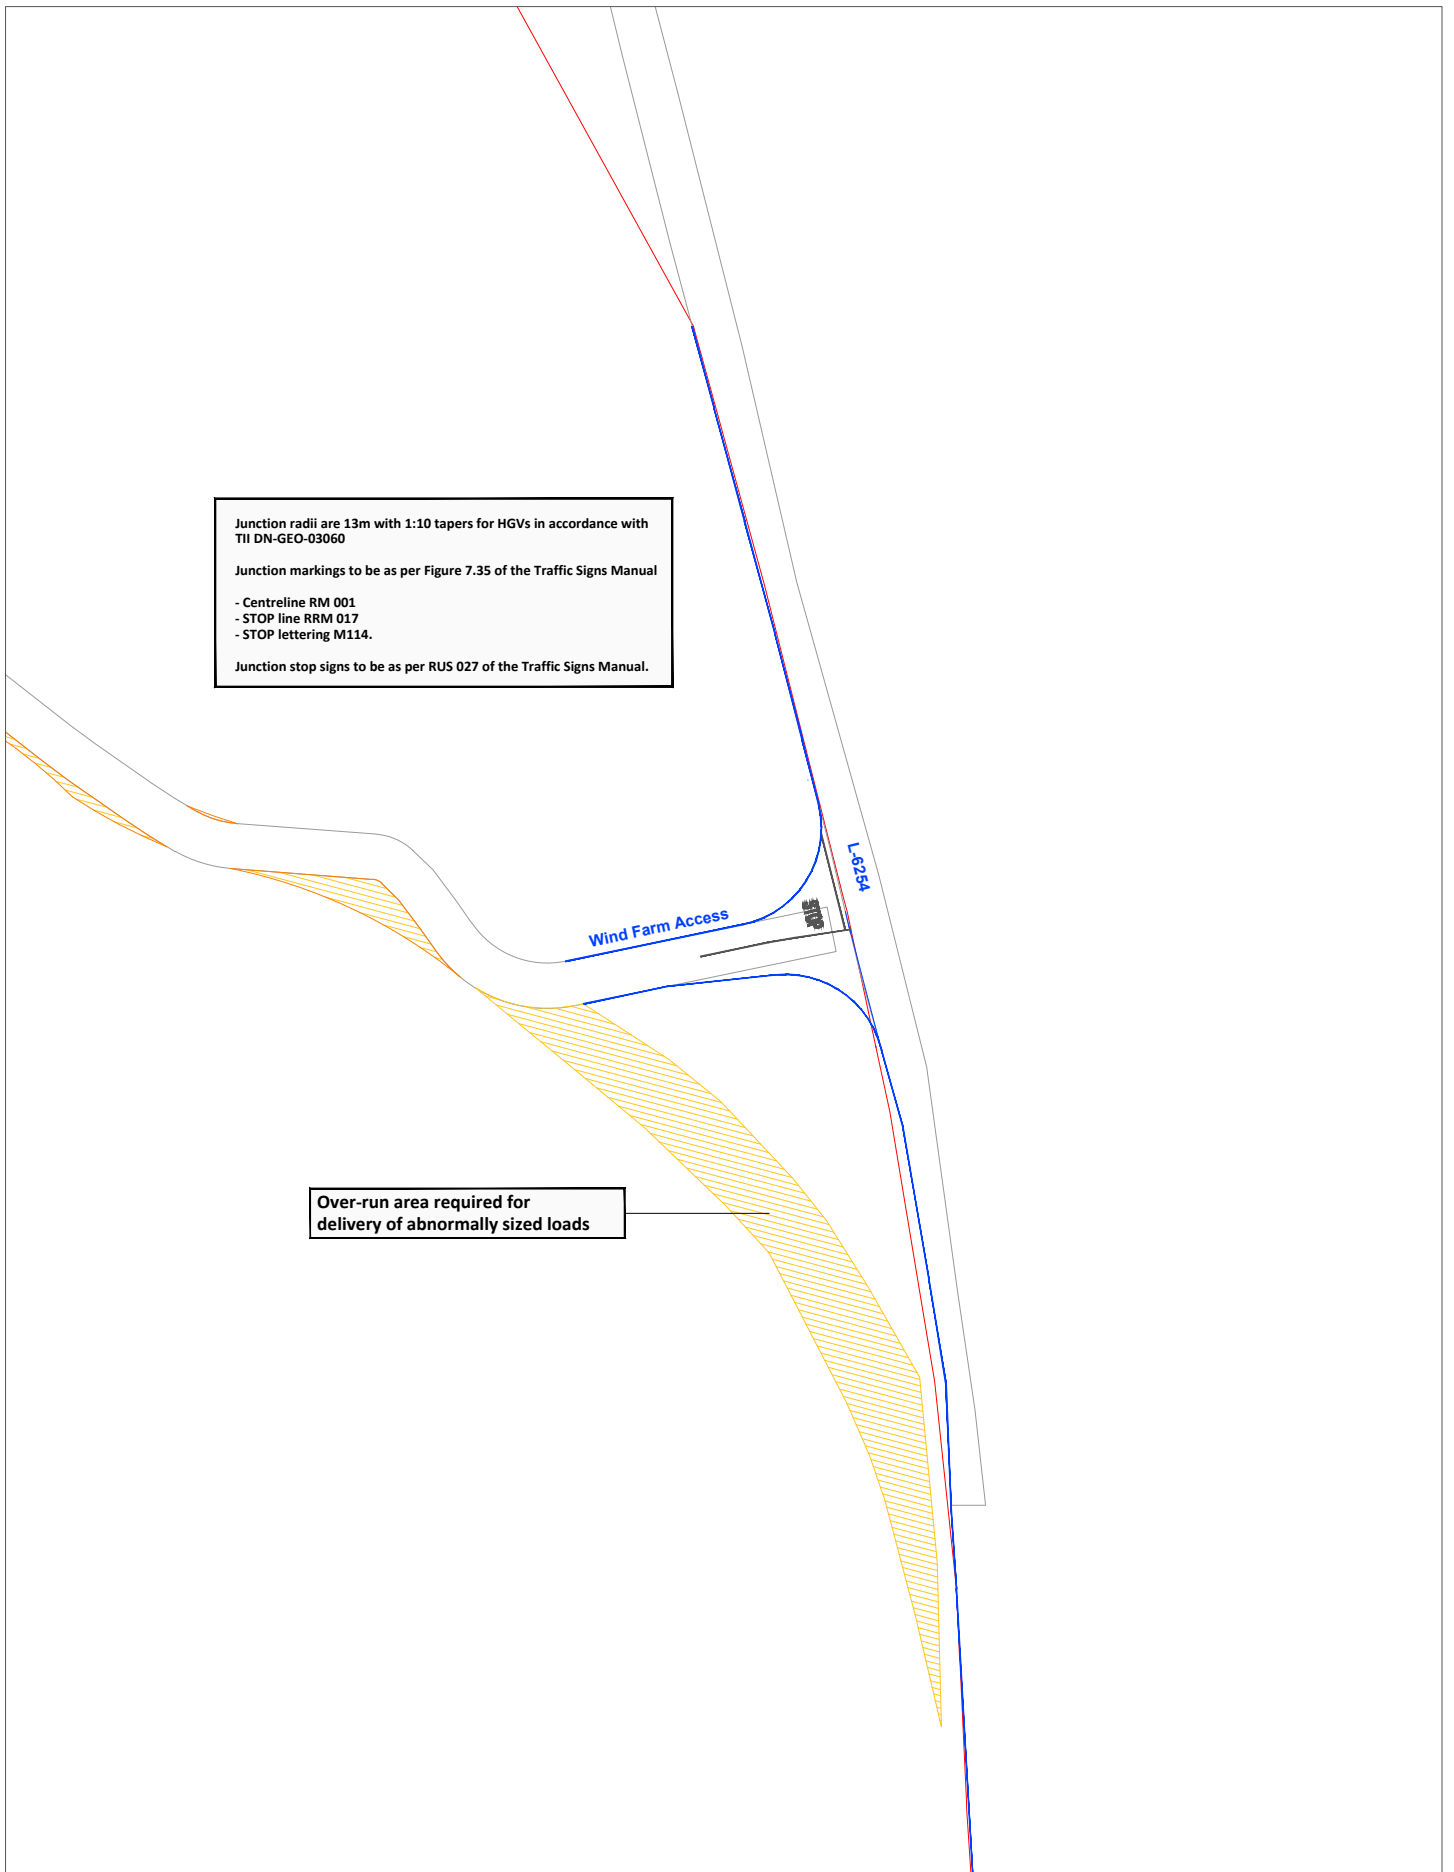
Location 7 - Proposed access junction on the L-6254, junction layout
